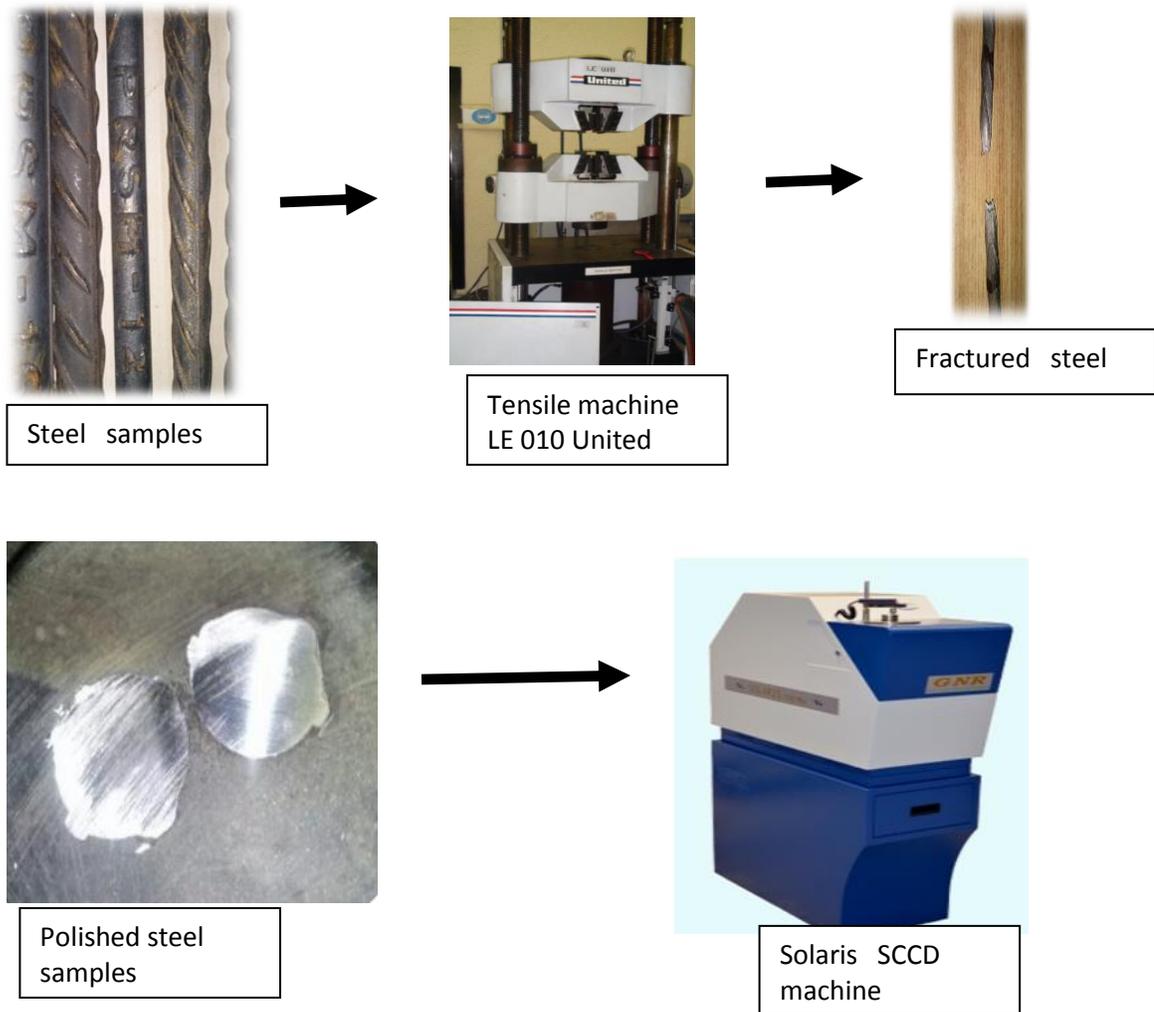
1: Showing Samples, Tensile testing machine, polished sample and the Solaris SCCD chemical composition machine respectively.
